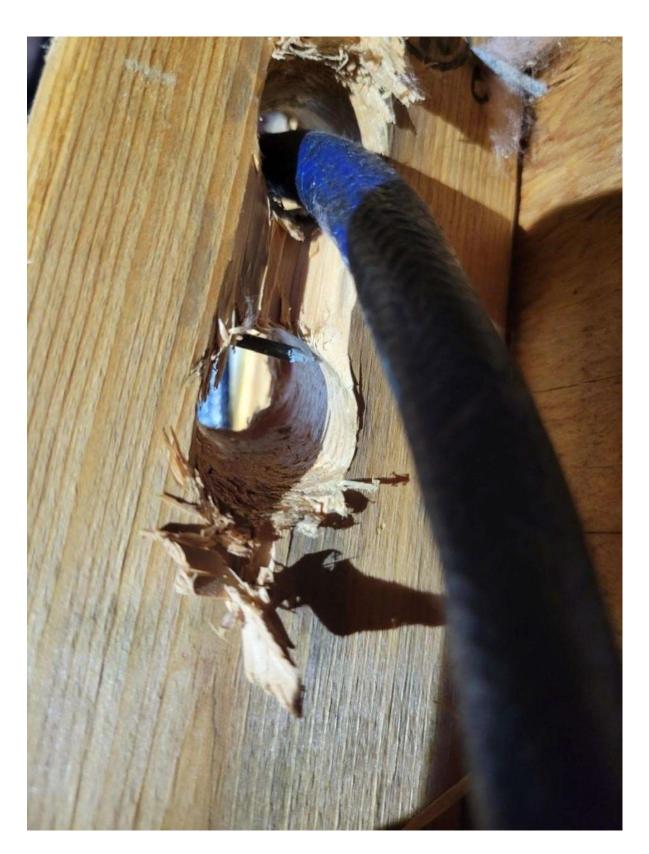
Hole in 2x4 stud showing the nail that caused the damage to the feeder cable.
